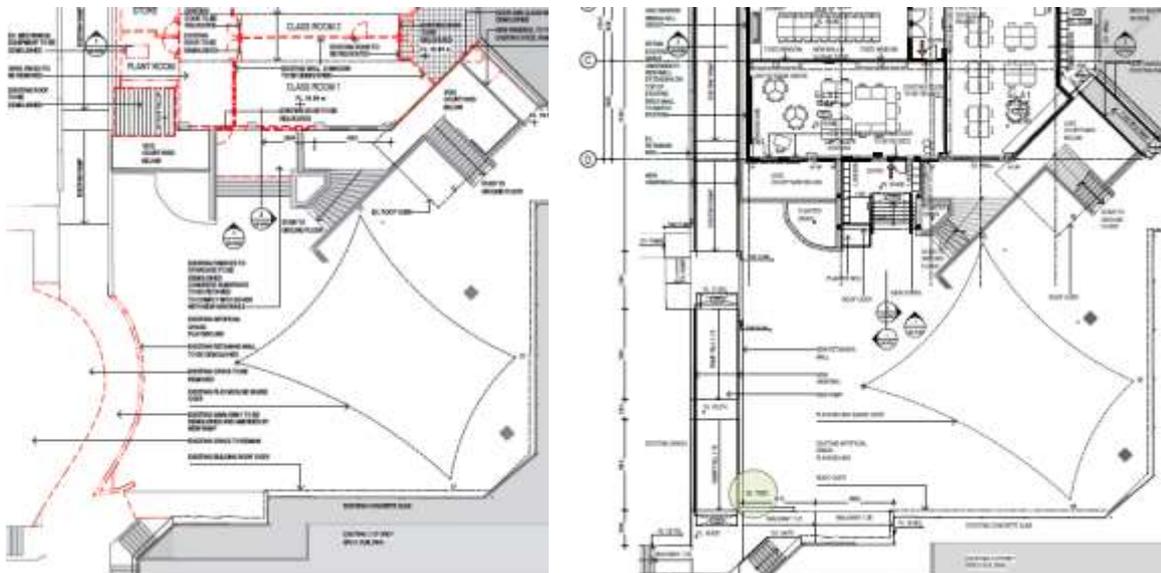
Existing access ramp to be demolished (LHS) and proposed new access ramp (RHS)
